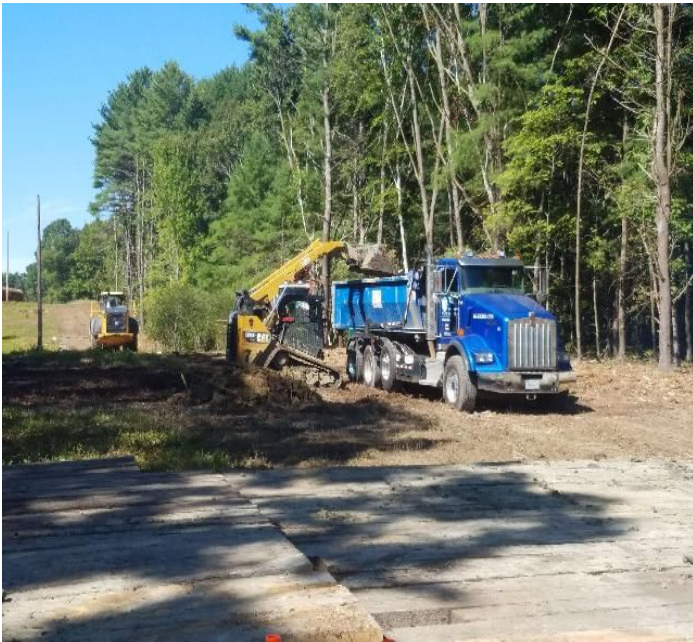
Hauling off soil that was broadcasted on the Pickering Property (9-05-19).
